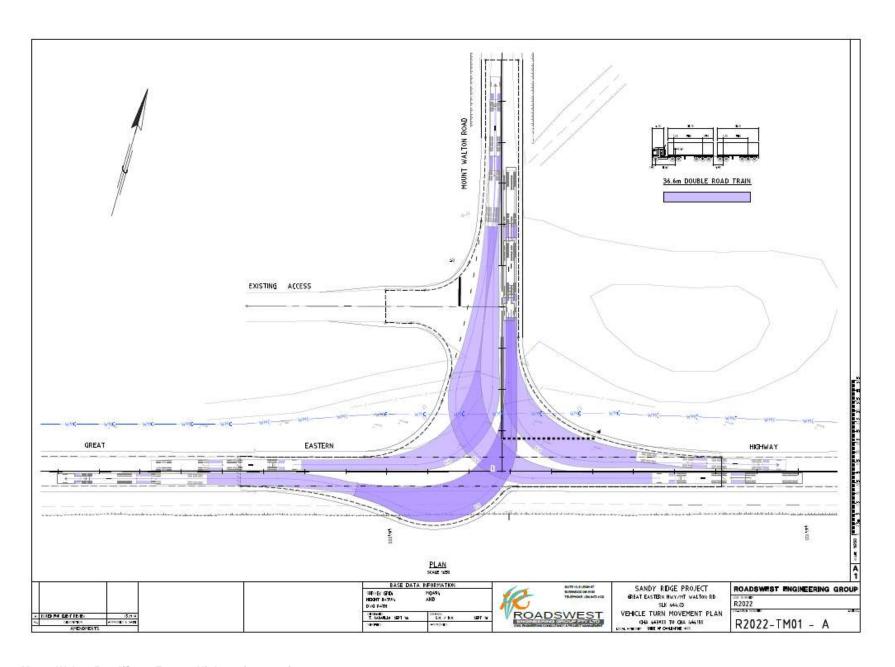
Mount Walton Road/Great Eastern Highway intersection
